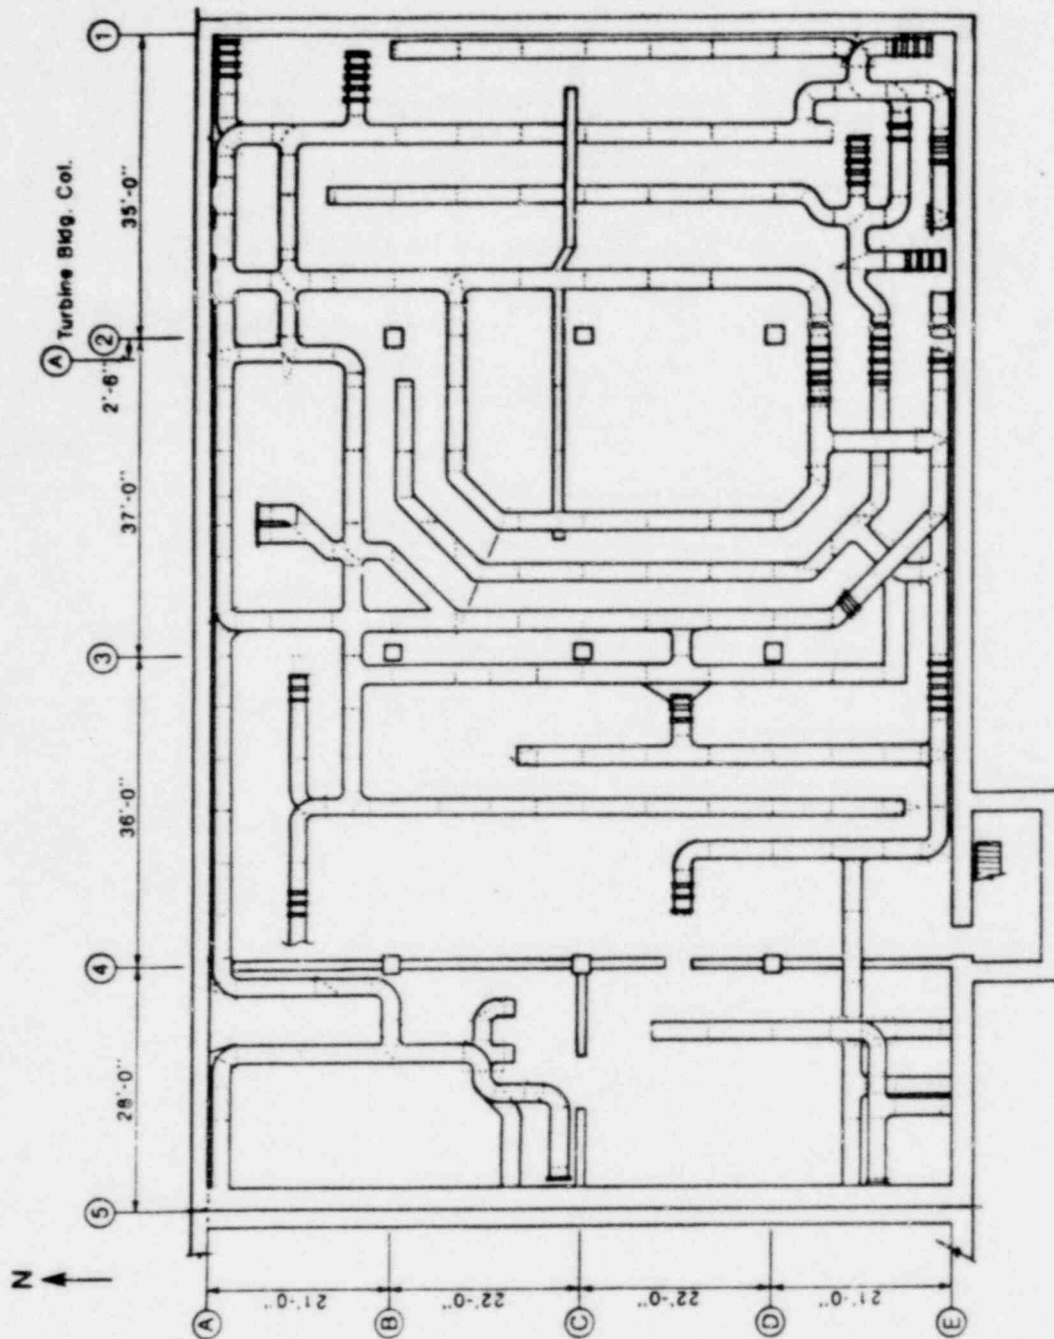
The typical configuration of cable trays in this area is floor-to-ceiling with up to 10 tiers. The trays are connected to the ceiling using the standard connection "boot" either bolted or welded to overhead structural steel wide-flange beams. The floor connection is made by welding to a base plate either embedded in or anchor-bolted to the floor. On multiple-tiered trays, at least every fourth tier is braced in the transverse direction. In addition to the large amount of horizontal trays, there are several runs of vertical trays connecting the switchgear area (elevation 21'6") with the control room (elevation 75'0").
